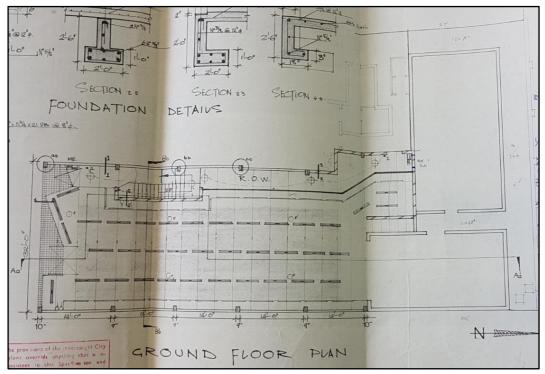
Detail from 1973 plan, showing the ground floor of Carter's Building (V. Jackson, 1973).
